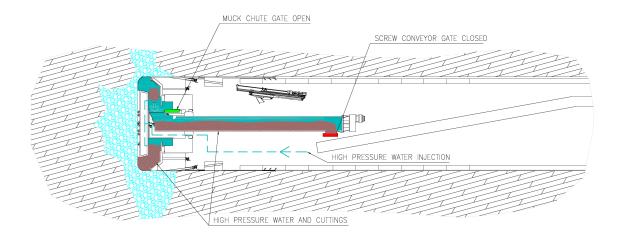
Muck chute gate is open with high pressure water and cuttings flowing onto the screw conveyor as machine advances forward
